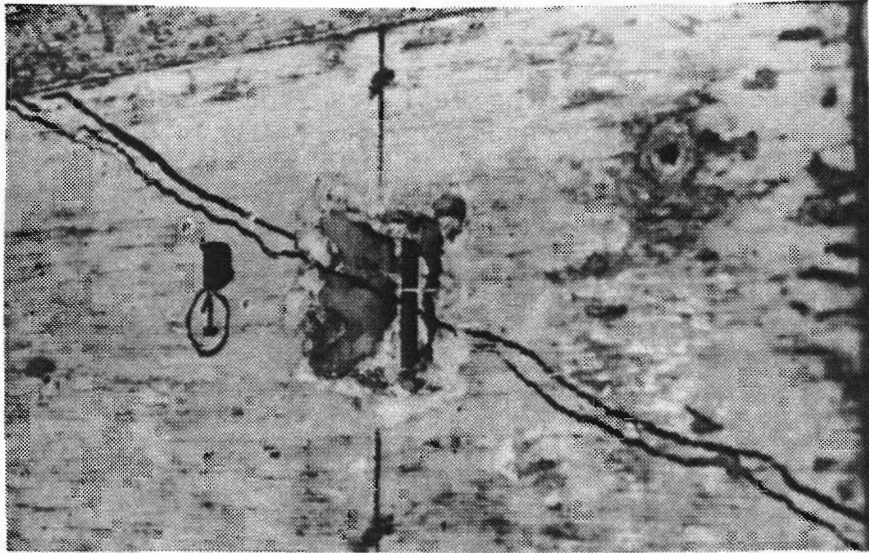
First stirrup fracture in south shear span (concrete cover removed to expose fracture)
